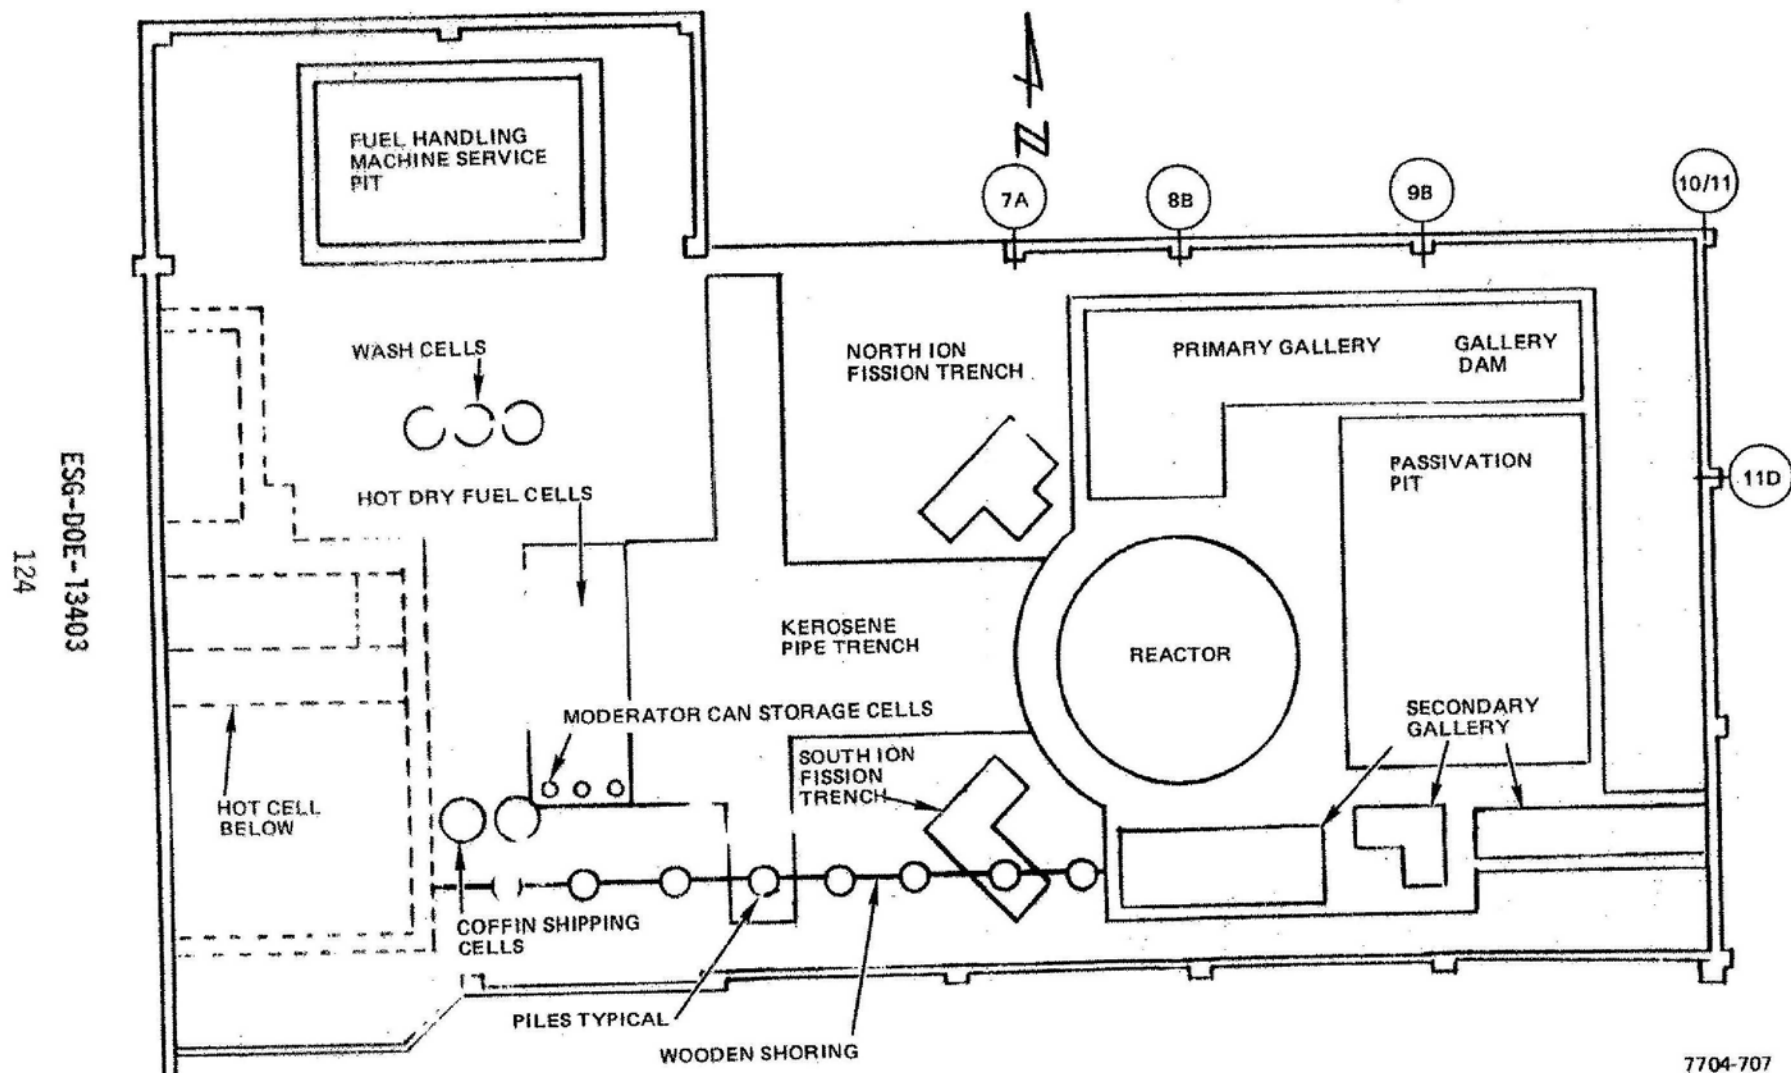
Location of High-Bay Retaining Wall and Column Identification
